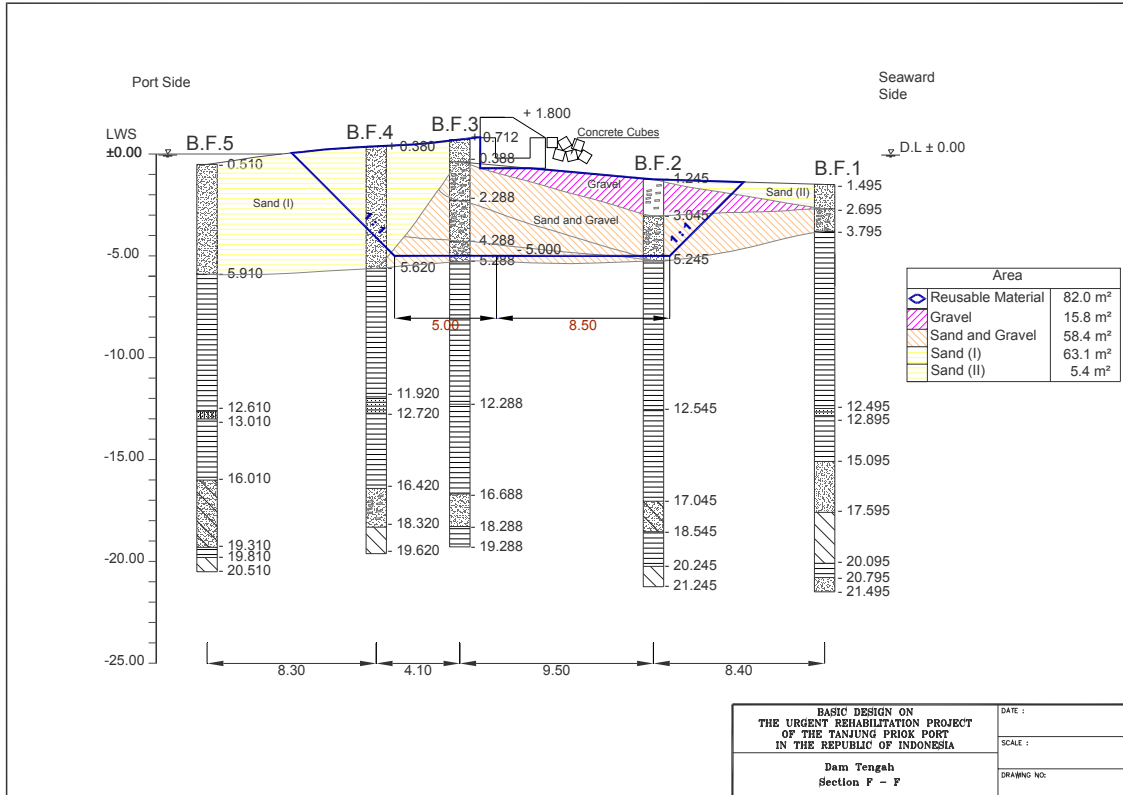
(5) Excavation Section shown with Boring-Log in the Segment 4,5
